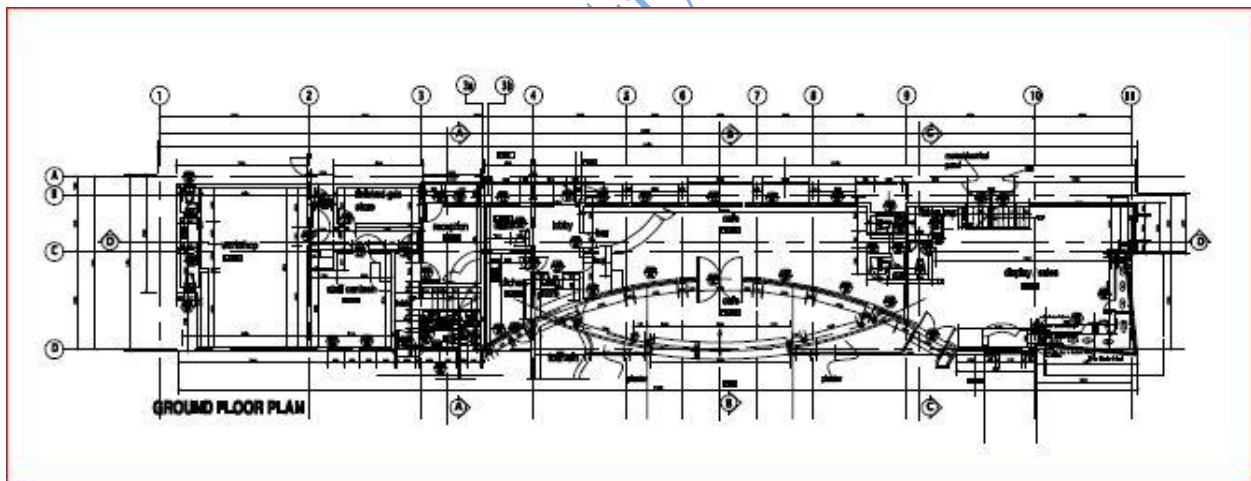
Figure Showing the Ground Floor Plan House of Adeola
